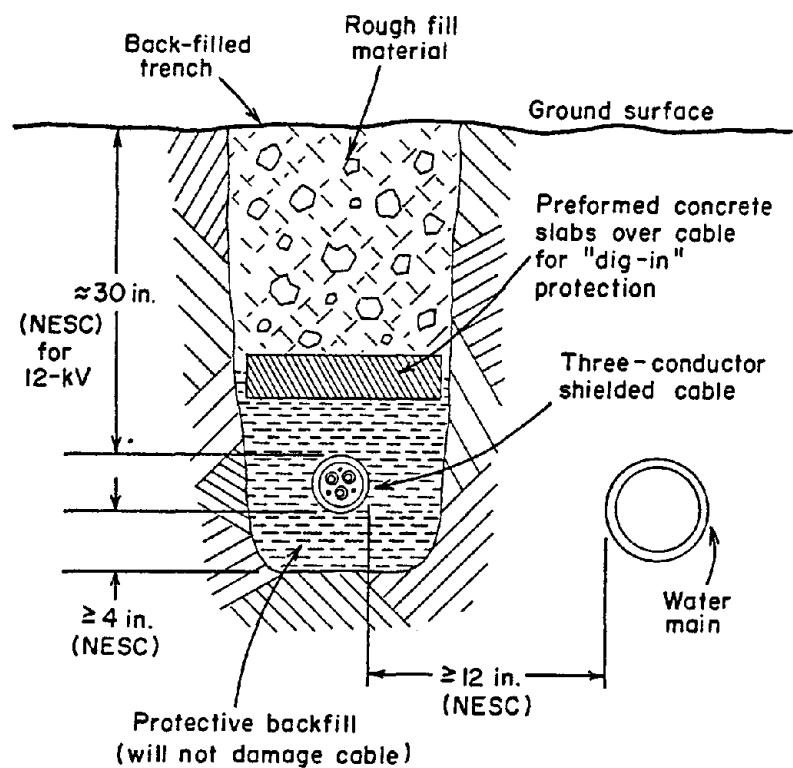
An example of a direct-buried cable installation, showing recommended practices and several NESC requirements.
